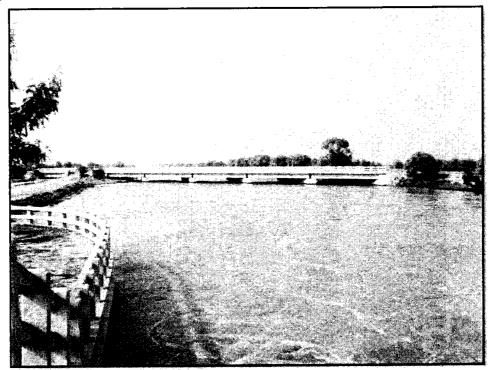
Four Lane Newly Constructed Bridge at RD 216+500
